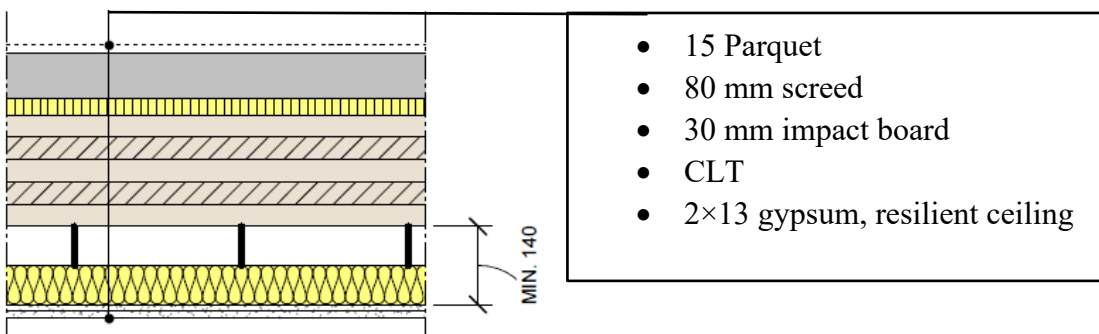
Floor structure 2 – CLT with screed on impact board and resilient ceiling.
